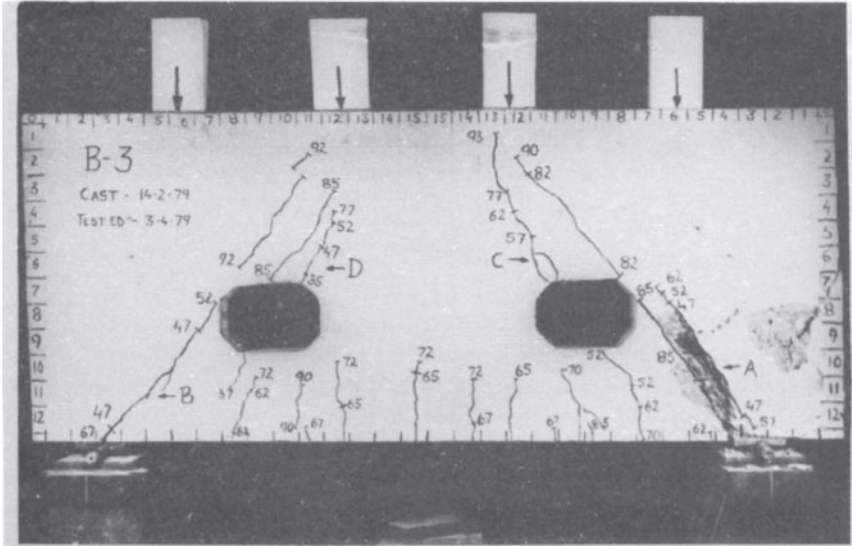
Crack patterns at failure of a typical deep beam with web openings (under four-point loading).
